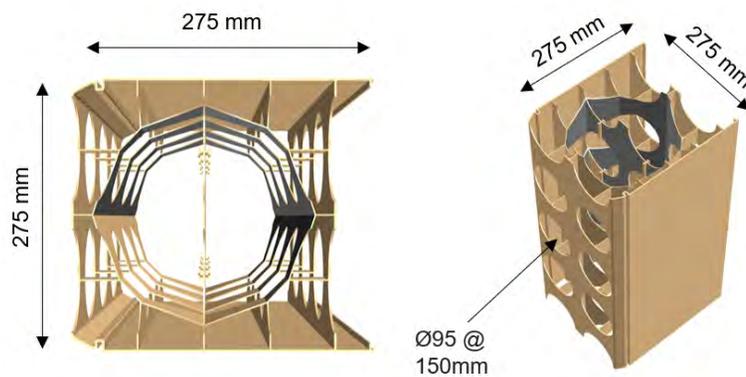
Three-dimensional views of 275 mm Dintel structural walling panels
